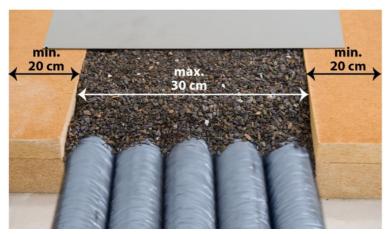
Pipe sections with insulated pipes and width from 20 cm must be covered with a 1 mm aluminium plate and with 5 cm overlap. <sup>2</sup>
